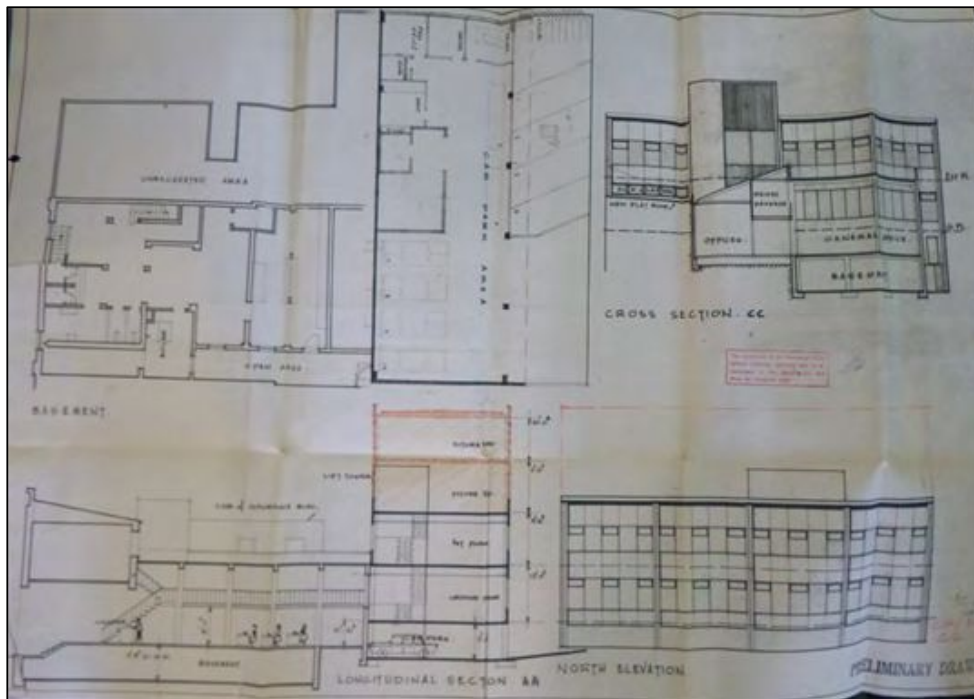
Plan showing elevations of 1965 extensions to 8 Esk Street.
